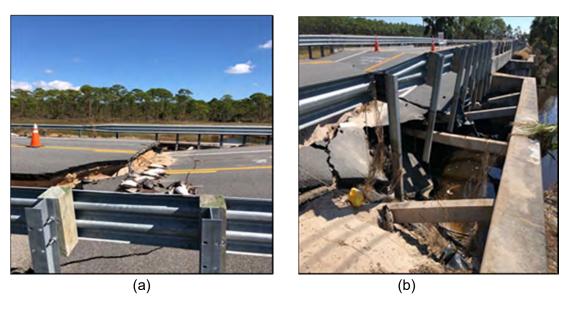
Surge-induced bridge failure on 30A South of Port St. Joe: (a) buckled road surface; (b) scour at abutment support.
